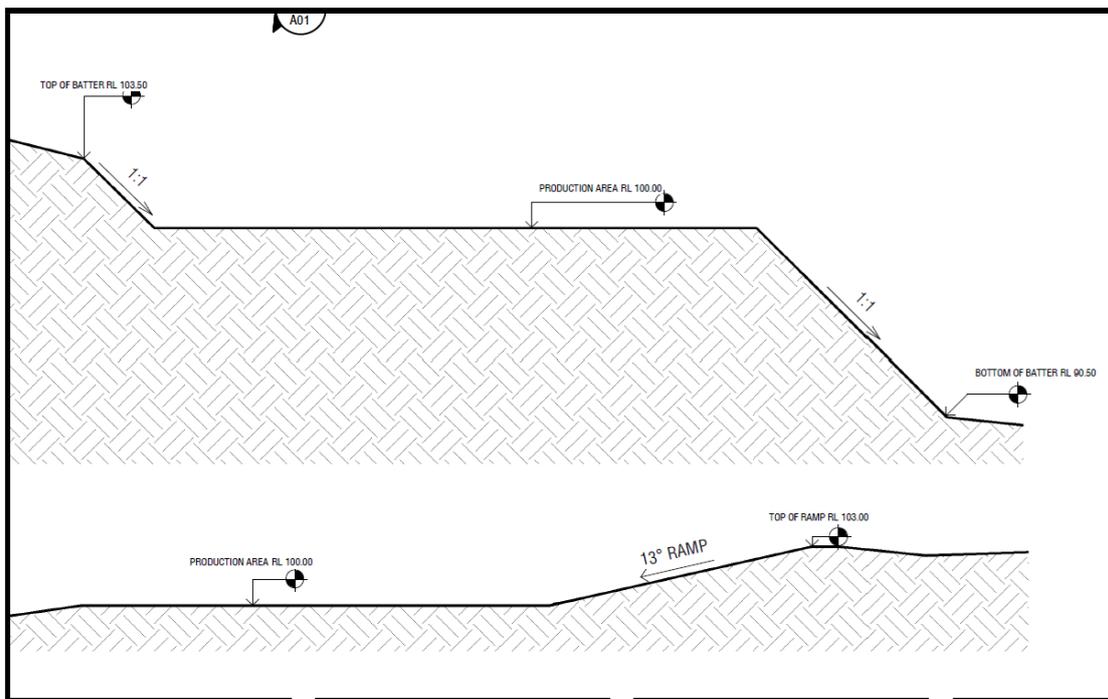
Proposed Material Storage area (Source: Plan Set (PGH 29 June 2023), Fig 6 of EIS)
